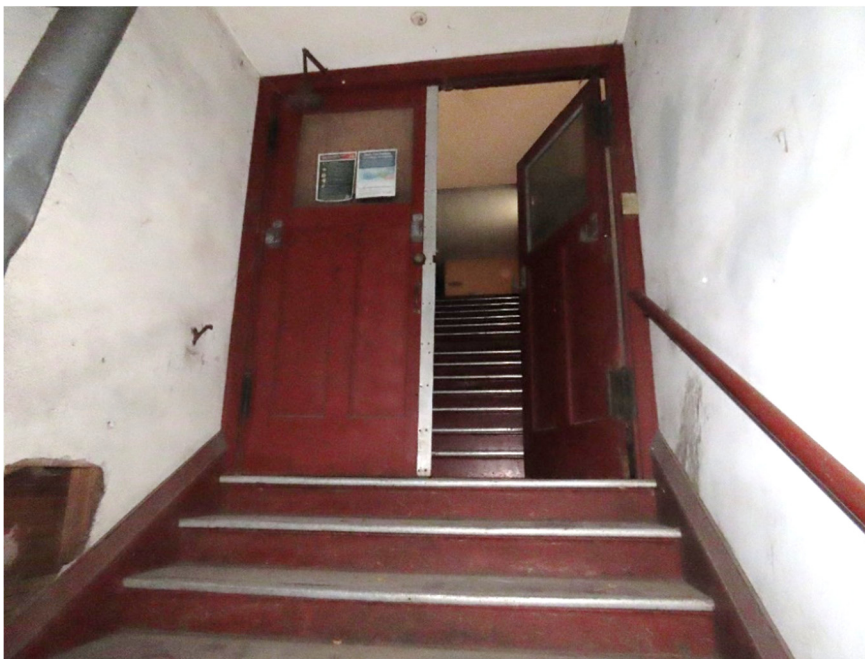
Original pair of doors at SE stair to second floor (ARG, October 2022).
